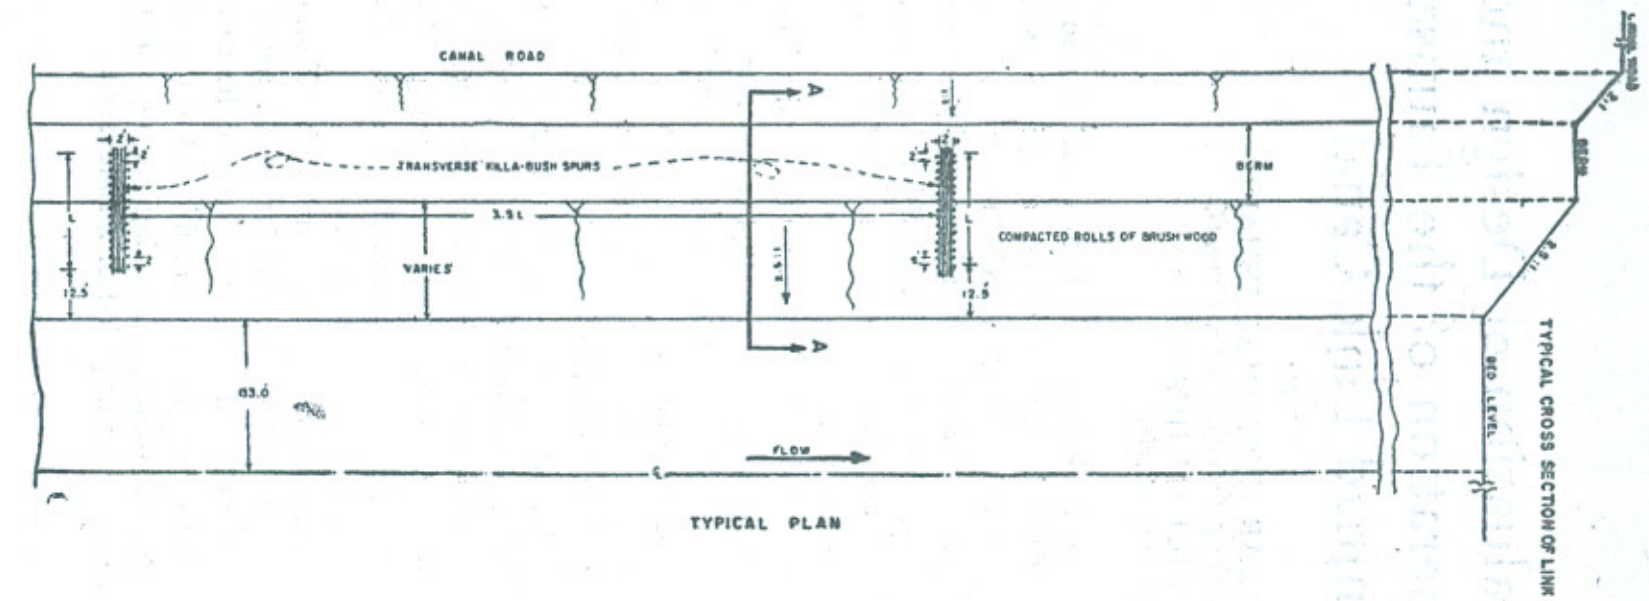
Typical Plan and Sections Showing Killa-Bush Spurs.
